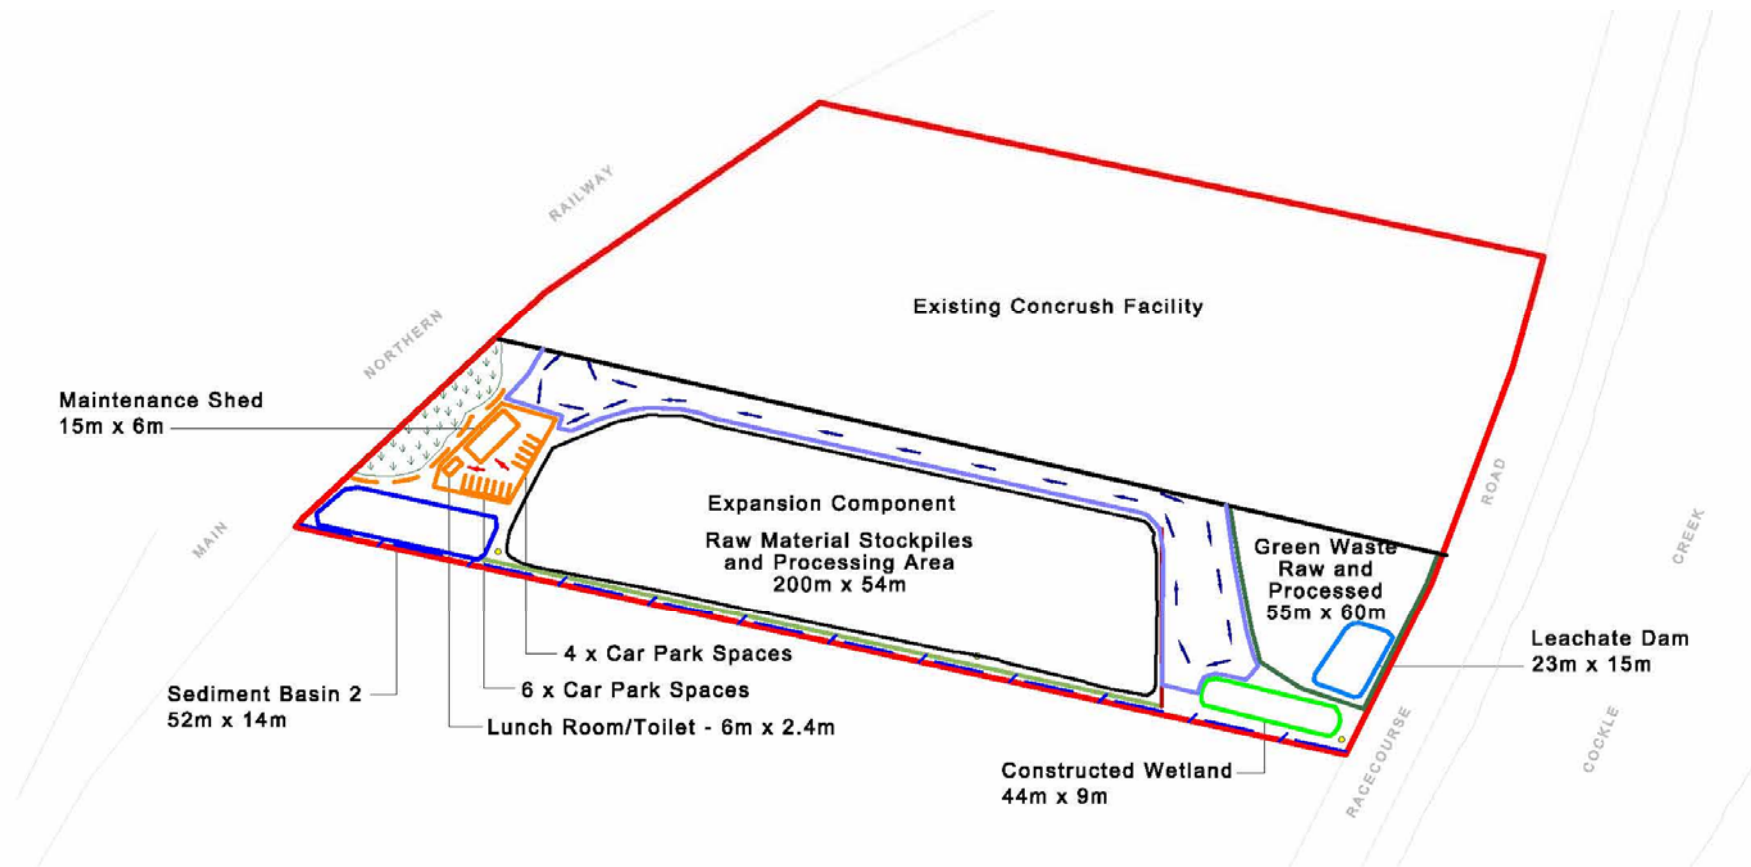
Layout of site and adjacent Concrush facility following Project completion.
